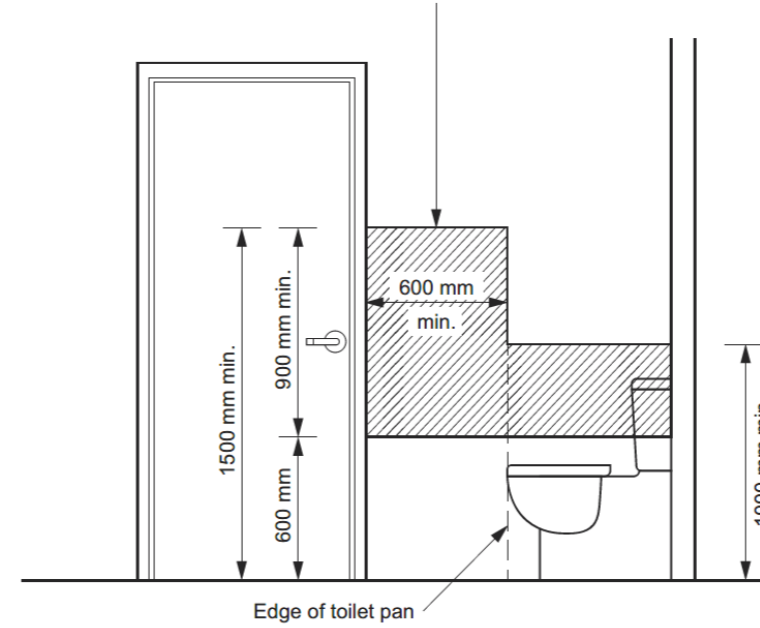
Location of noggings for a wall behind a toilet pan
